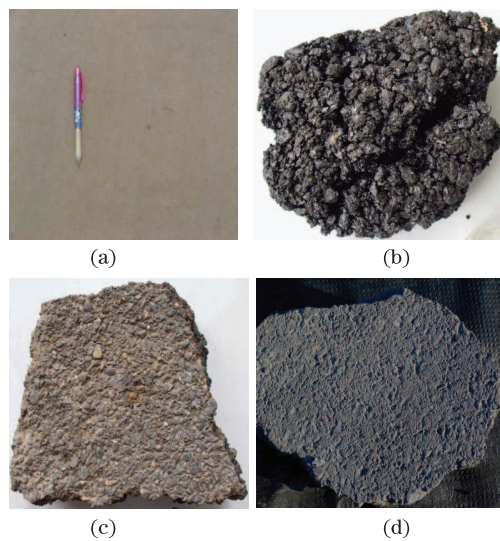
Road pavement samples used in the measurements of (a) concrete parking lot, (b) new asphalt pavement, and old asphalt samples (c) 1 and (d) 2.
